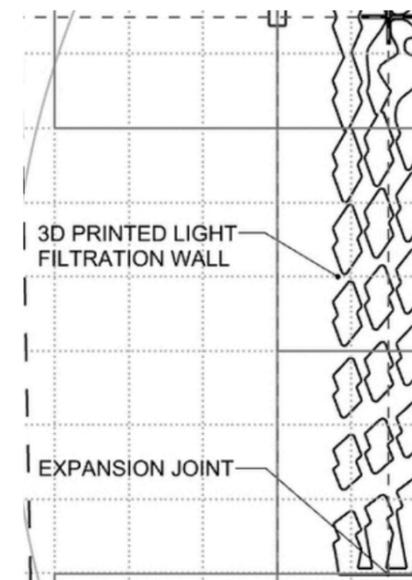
Wall inner geometry (Arquitectura Viva, 2024)
